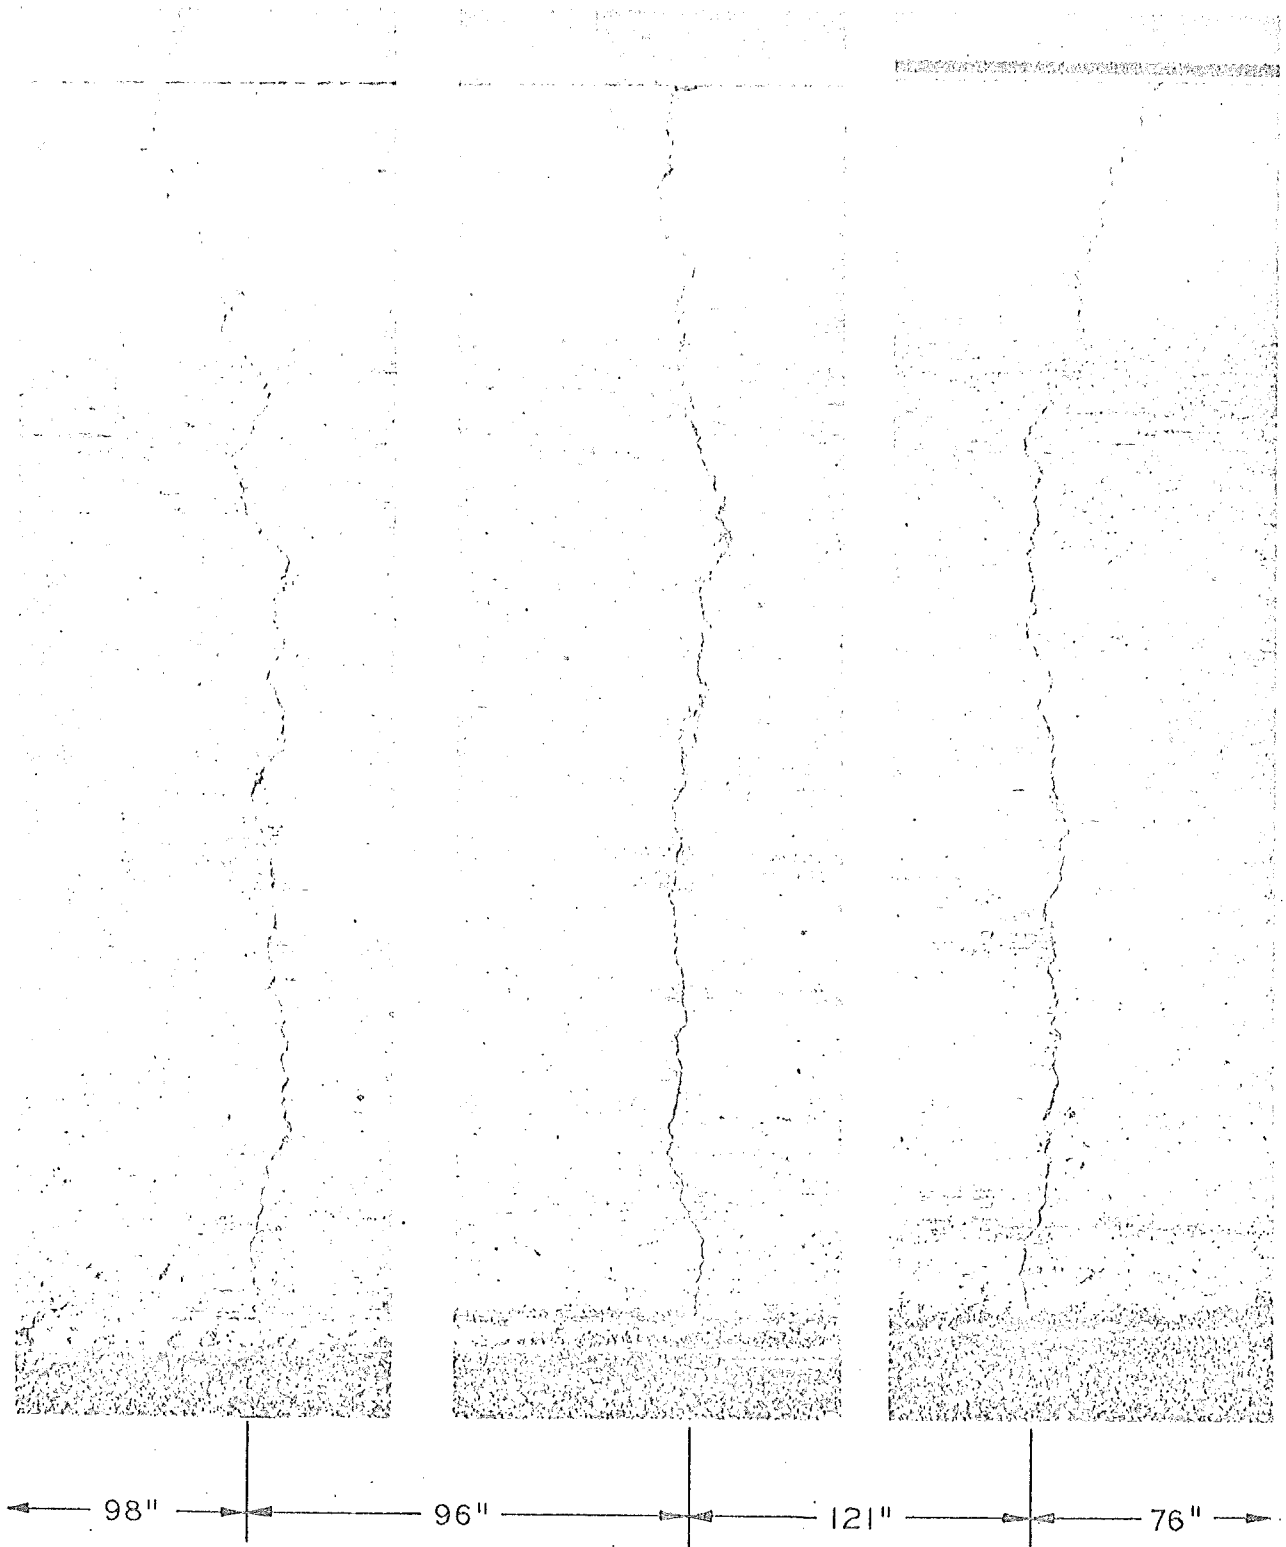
Appearance of cracks in area of large crack spacing in bar mat section.
